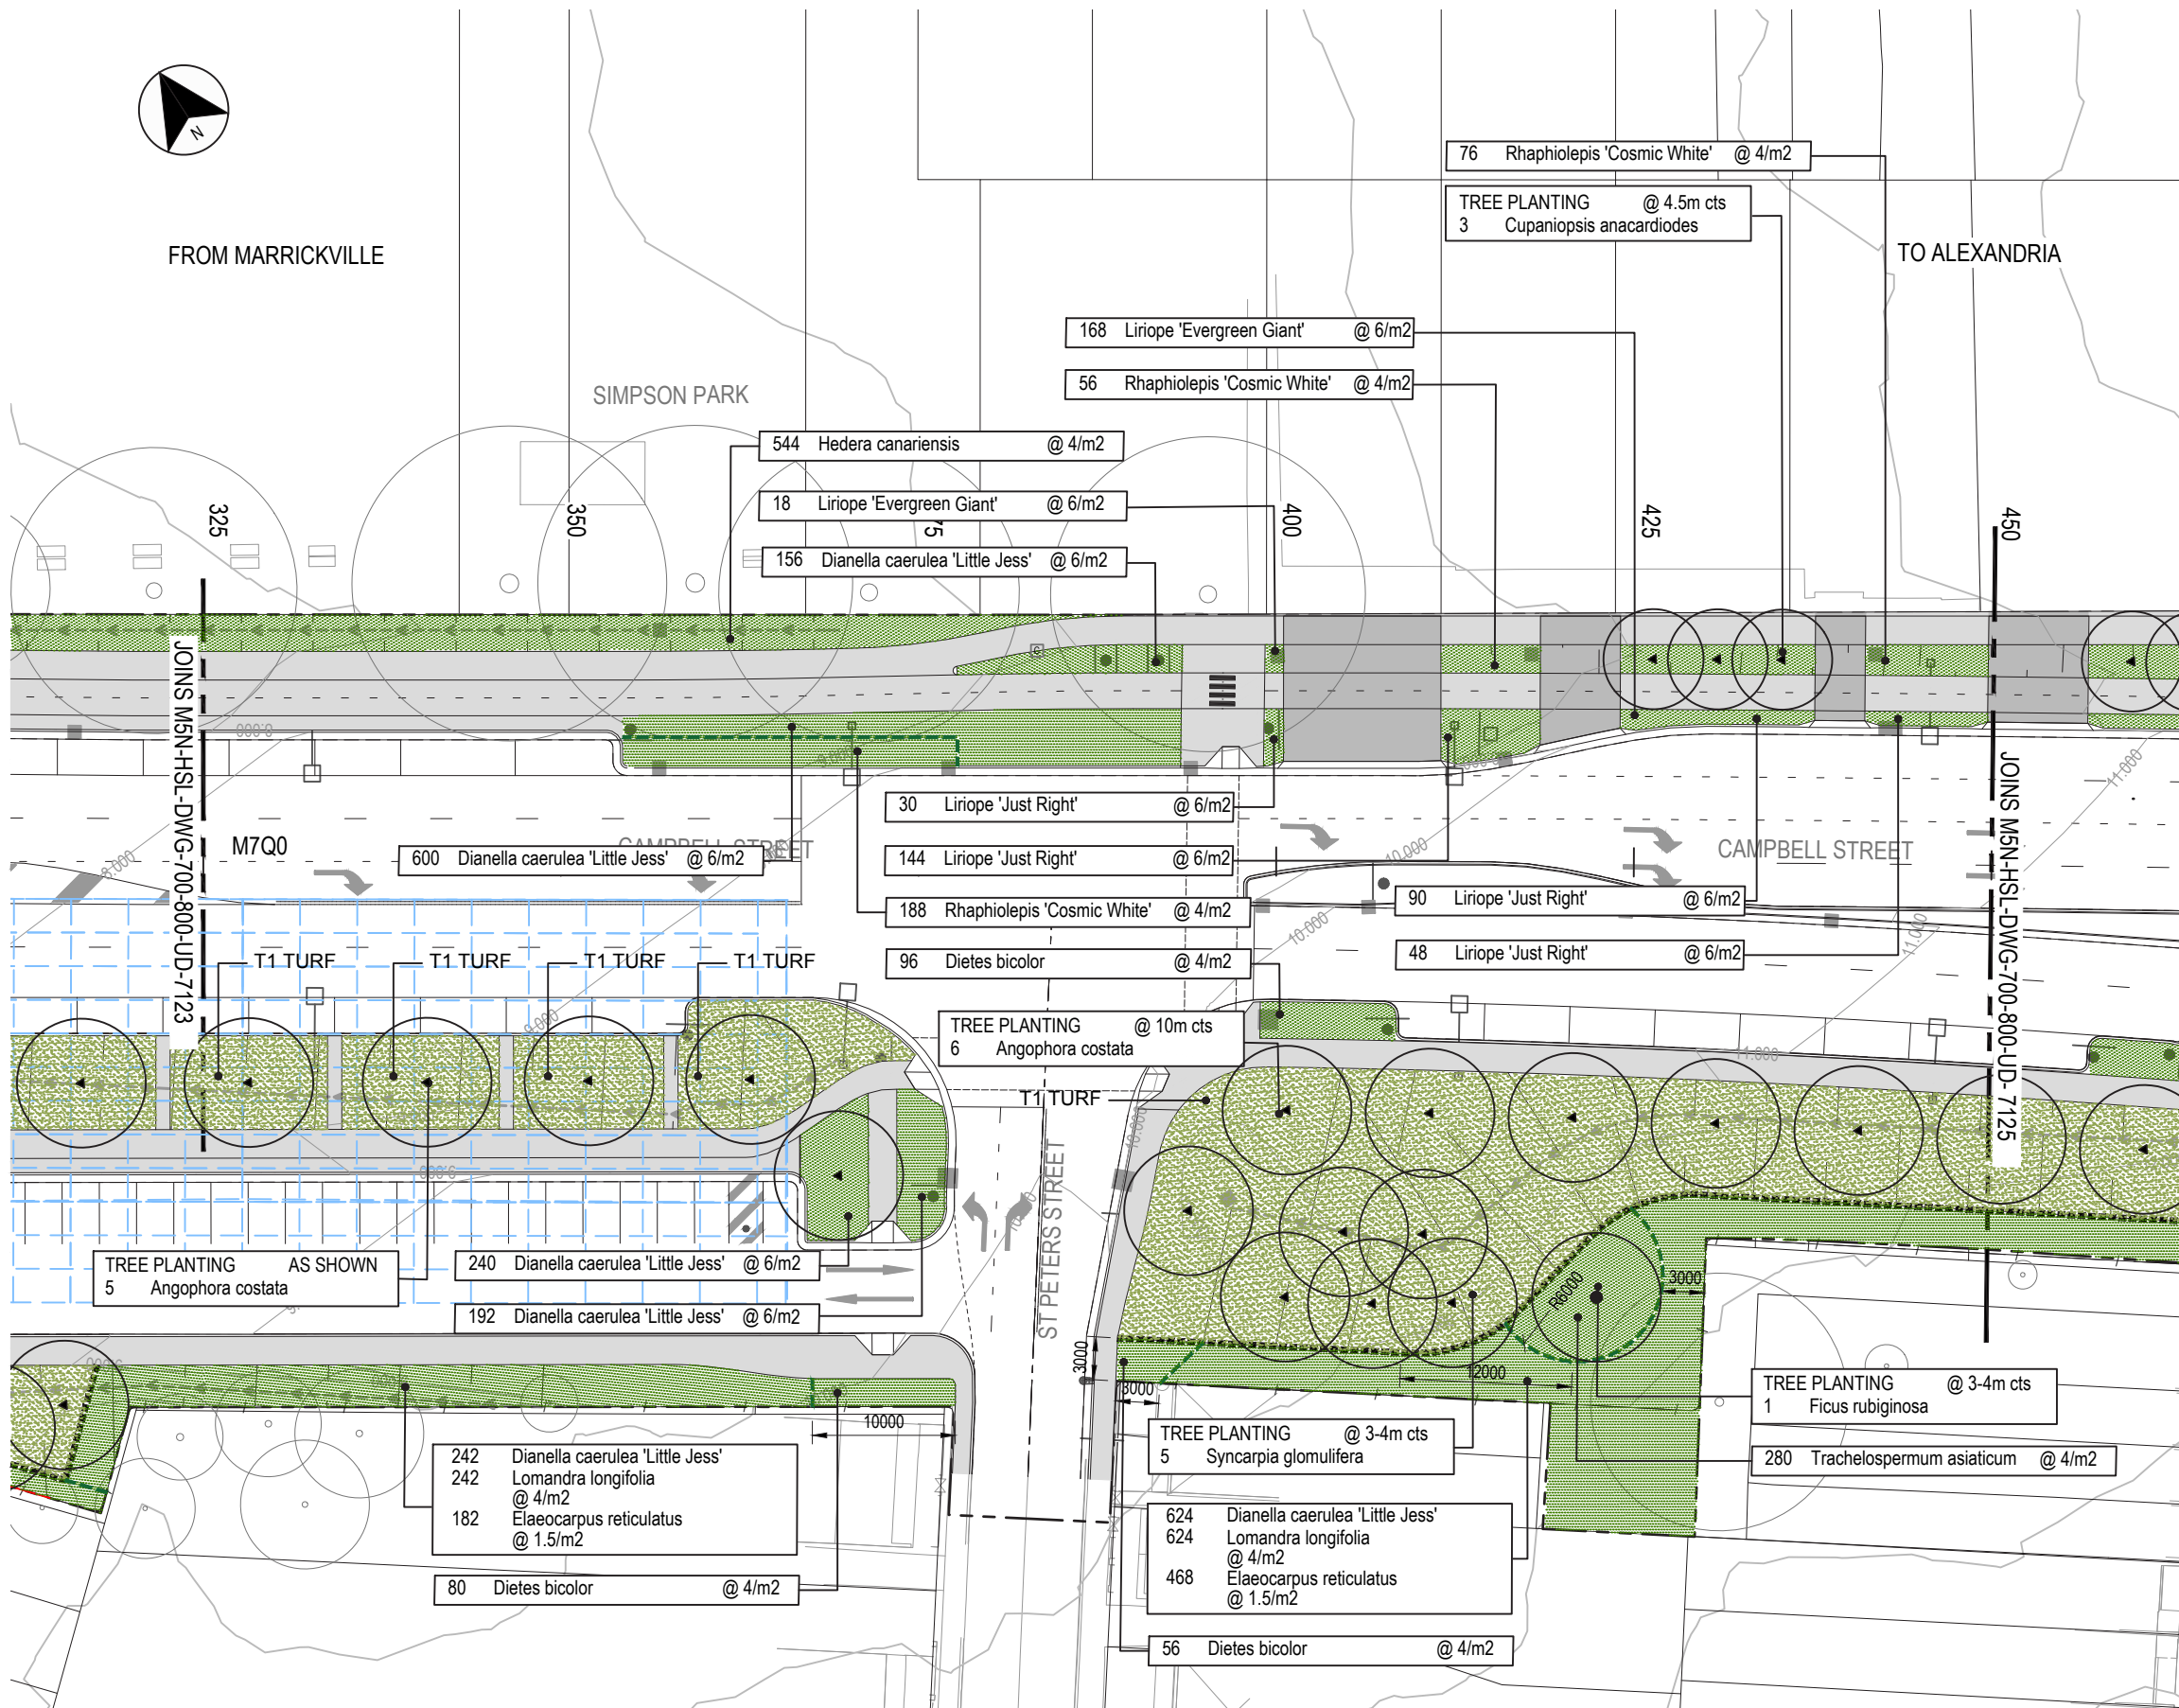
Campbell Street Green Link - Landscape Plans - Sheet 3 of 10
